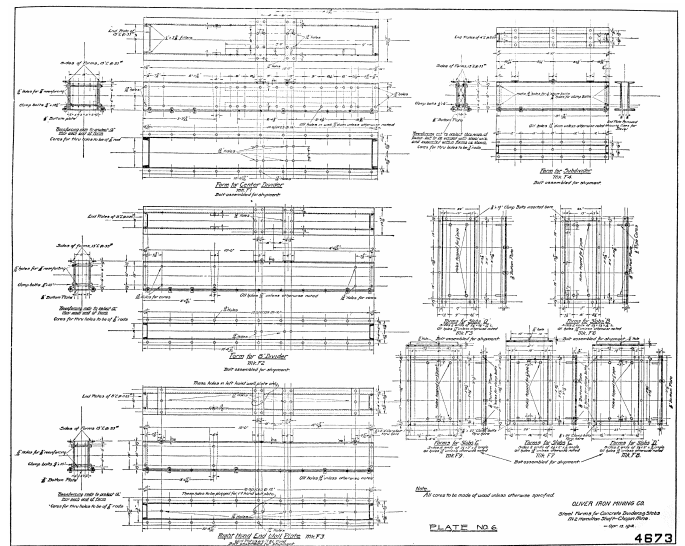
Steel Forms for Making Concrete Dividers and Slabs
